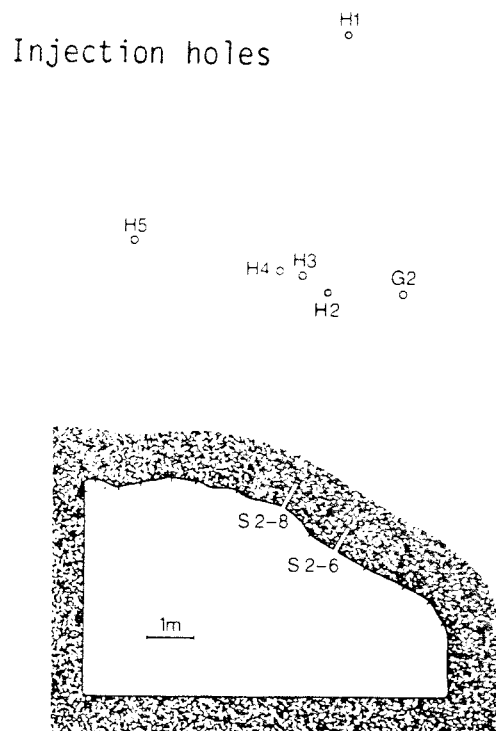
Location of injection and some collecting holes in fracture No. 2.
